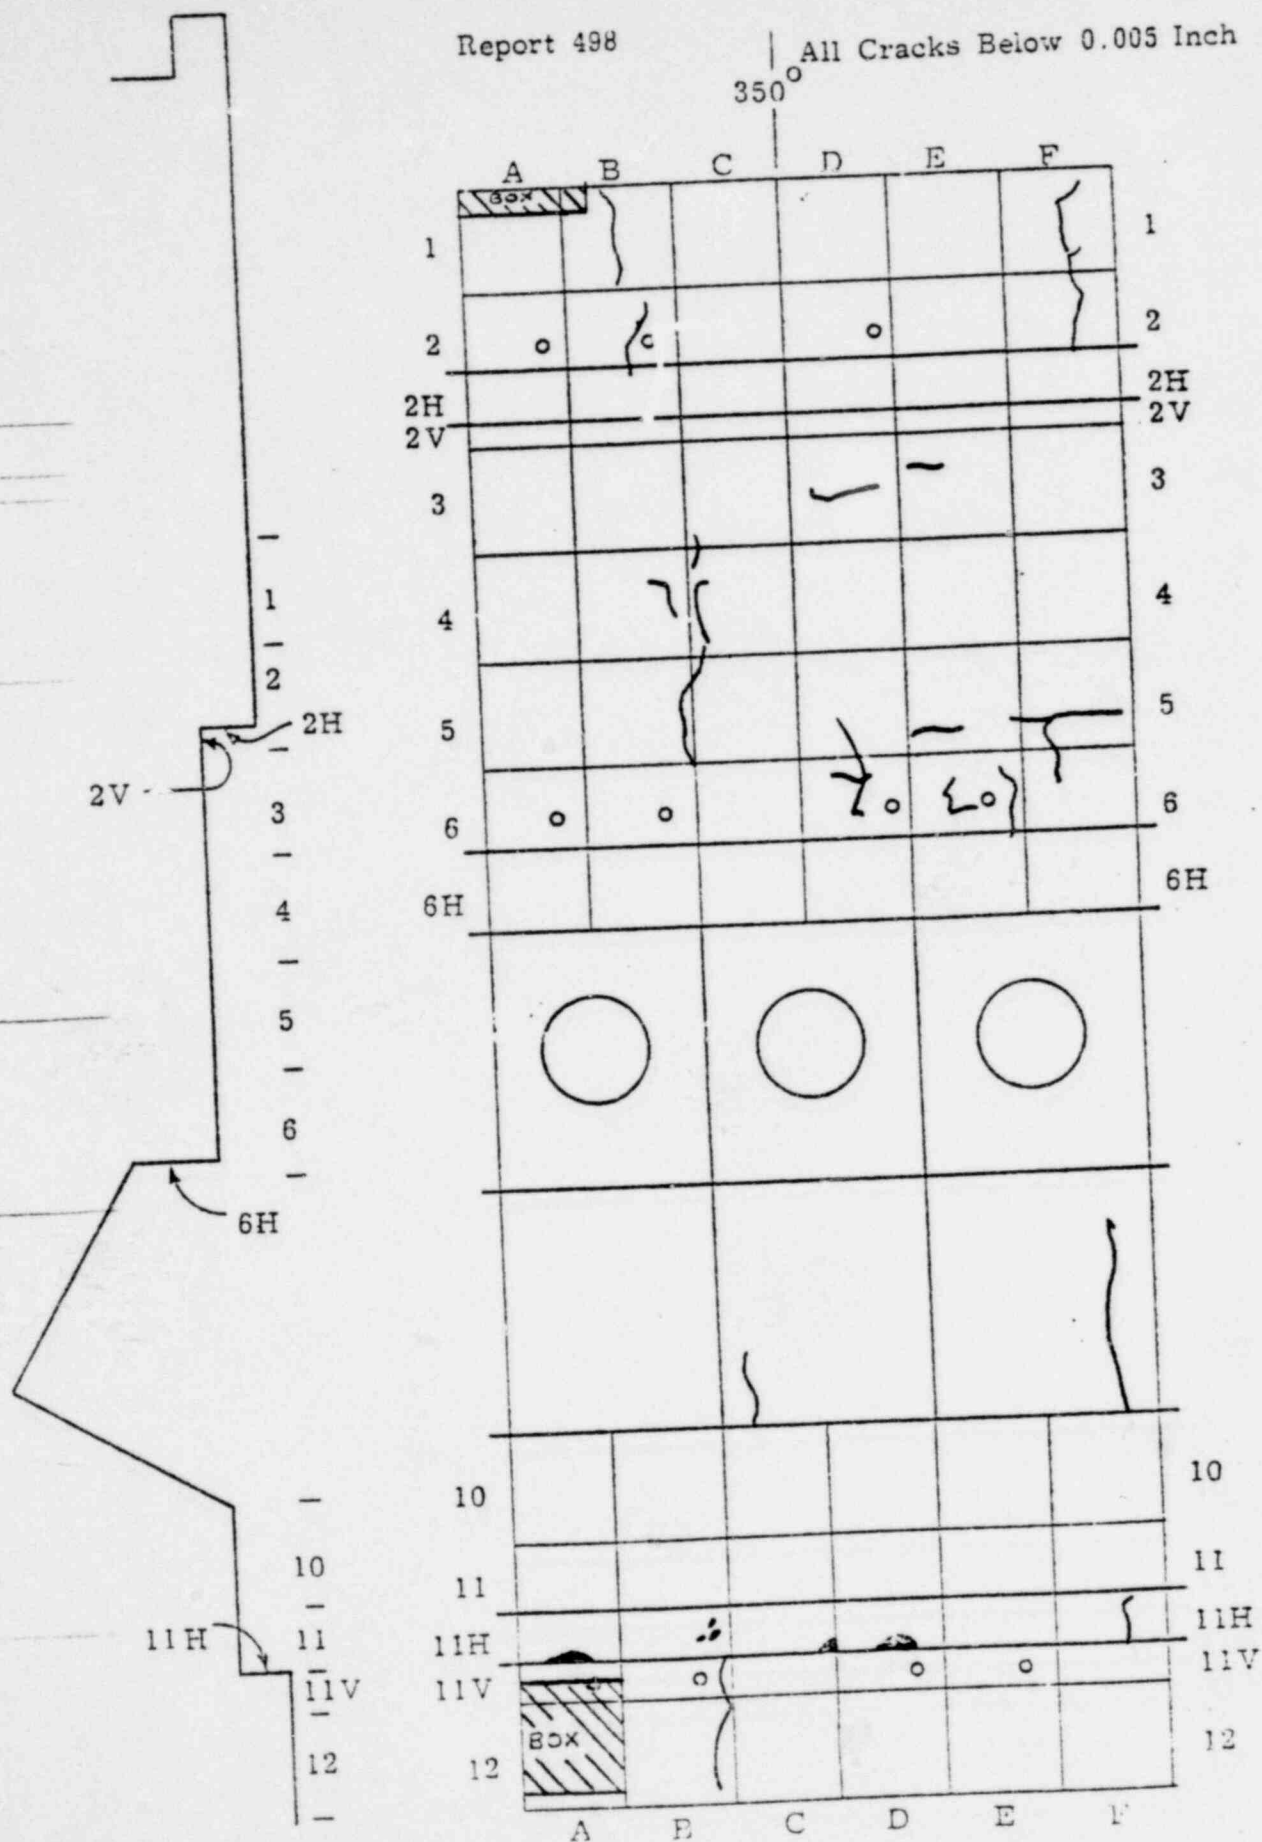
CRACK PATTERN AT AZIMUTH 350° FULL VERTICAL AND DOME PRESTRESS, JULY 5, 1973.
